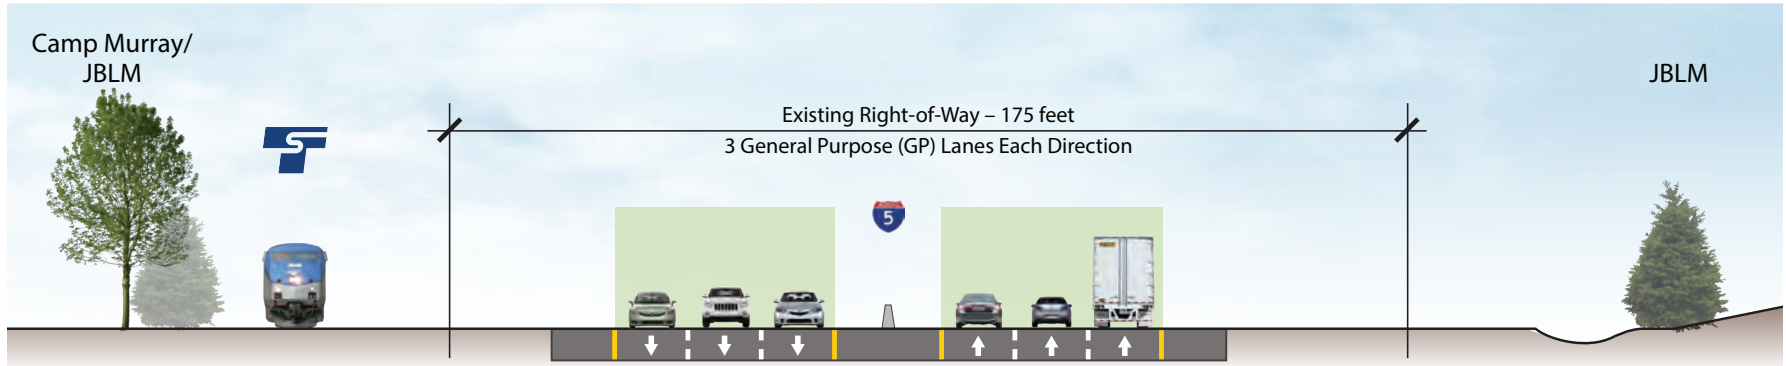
Existing Typical I-5 Section South of Thorne Lane
